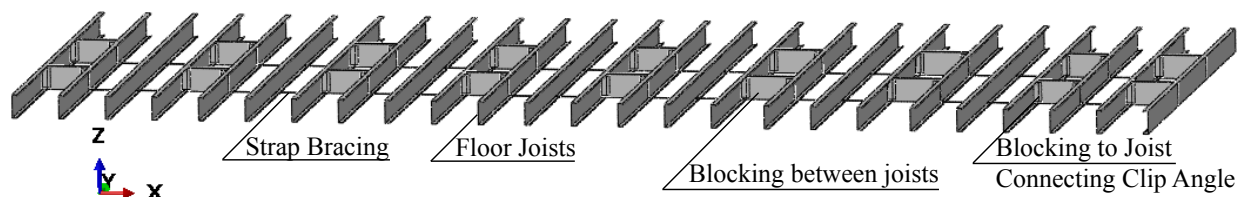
Blocking and strap bracing used to connect adjacent joists for lateral support mimicking detailing used in full scale building tests.
